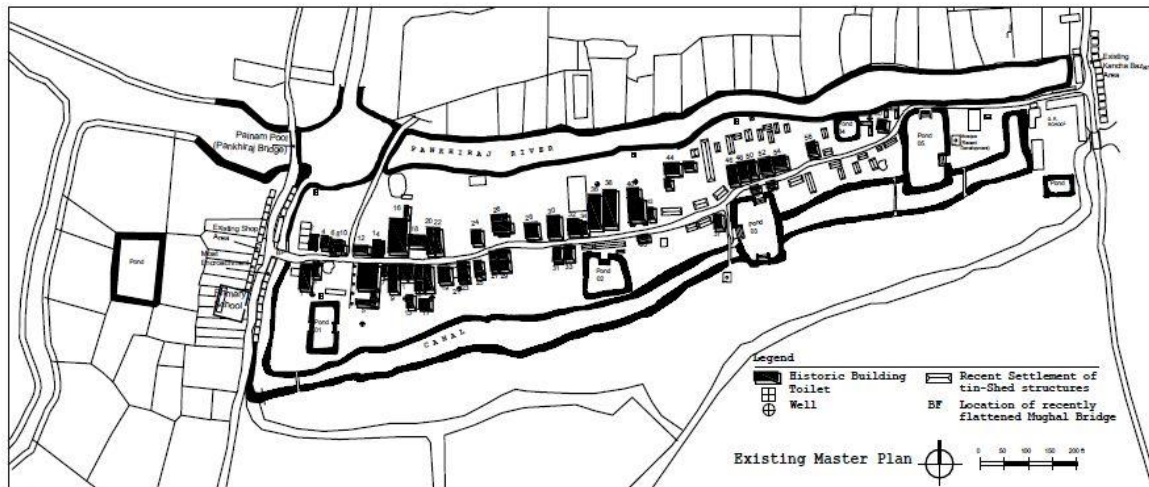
The Site Plan of Panam Nagar (Source - Shaikh, 2006)
